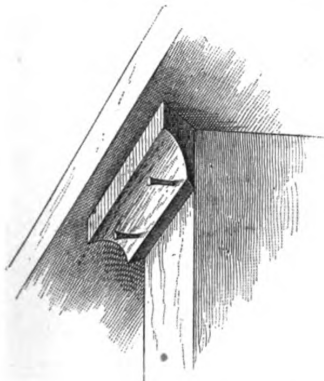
View of Bracket, Showing Face Mold Tacked in Position.
